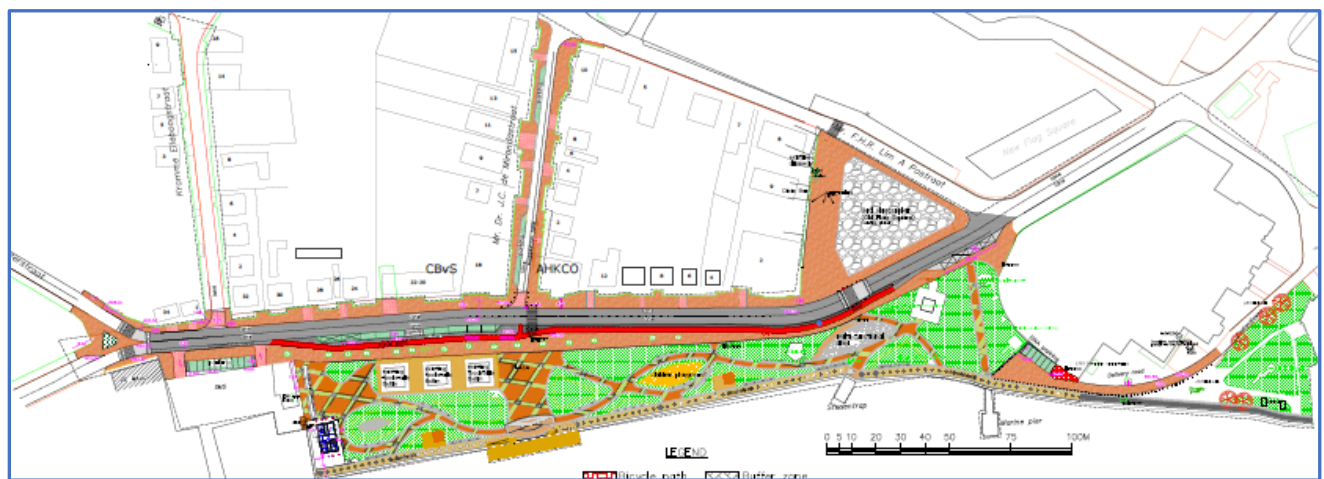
layout design of new Waterfront area (source: drawing's dossier ILACO-IBT)
